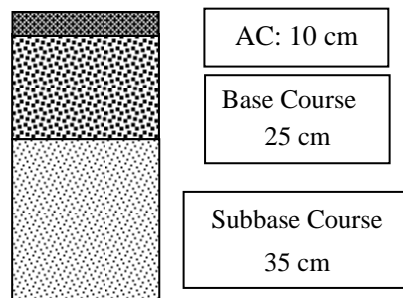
Alternative Pavement Structure Adopted in Loan Appraisal
